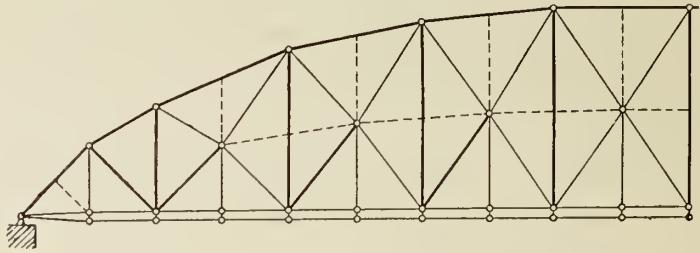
Ohio Bridge near Wheeling. 159 metres (522 feet) span. Height one sixth. Double bottom flange.
